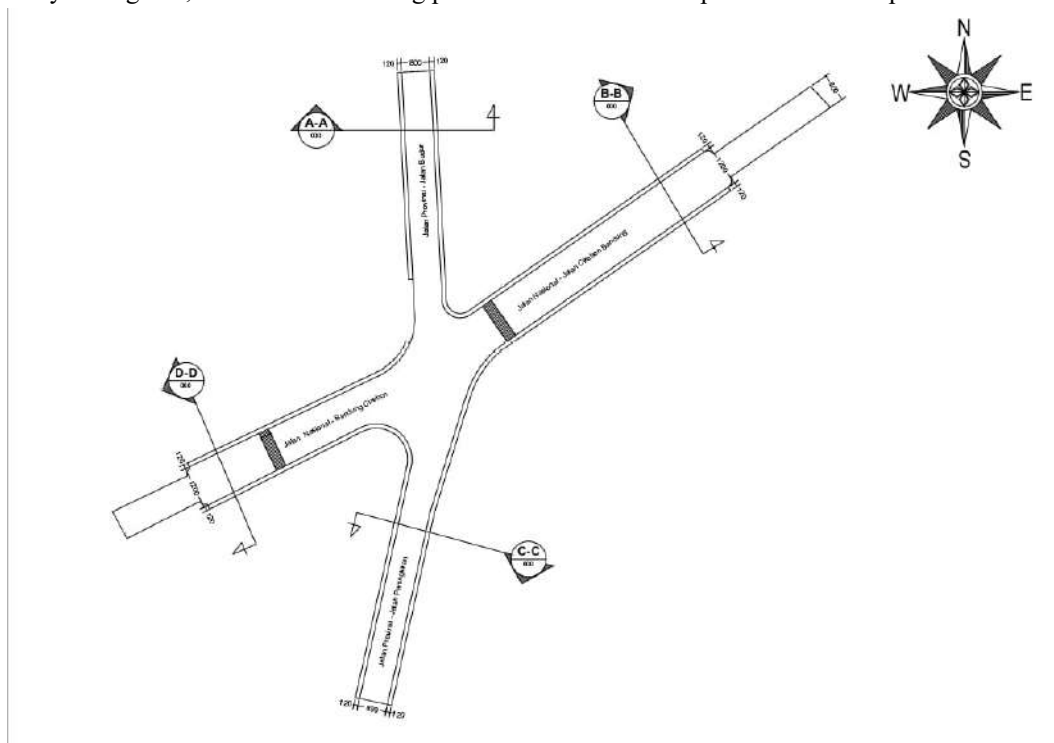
Geometric layout and road orientation at Panjalin Intersection (field drawing, 2025).
